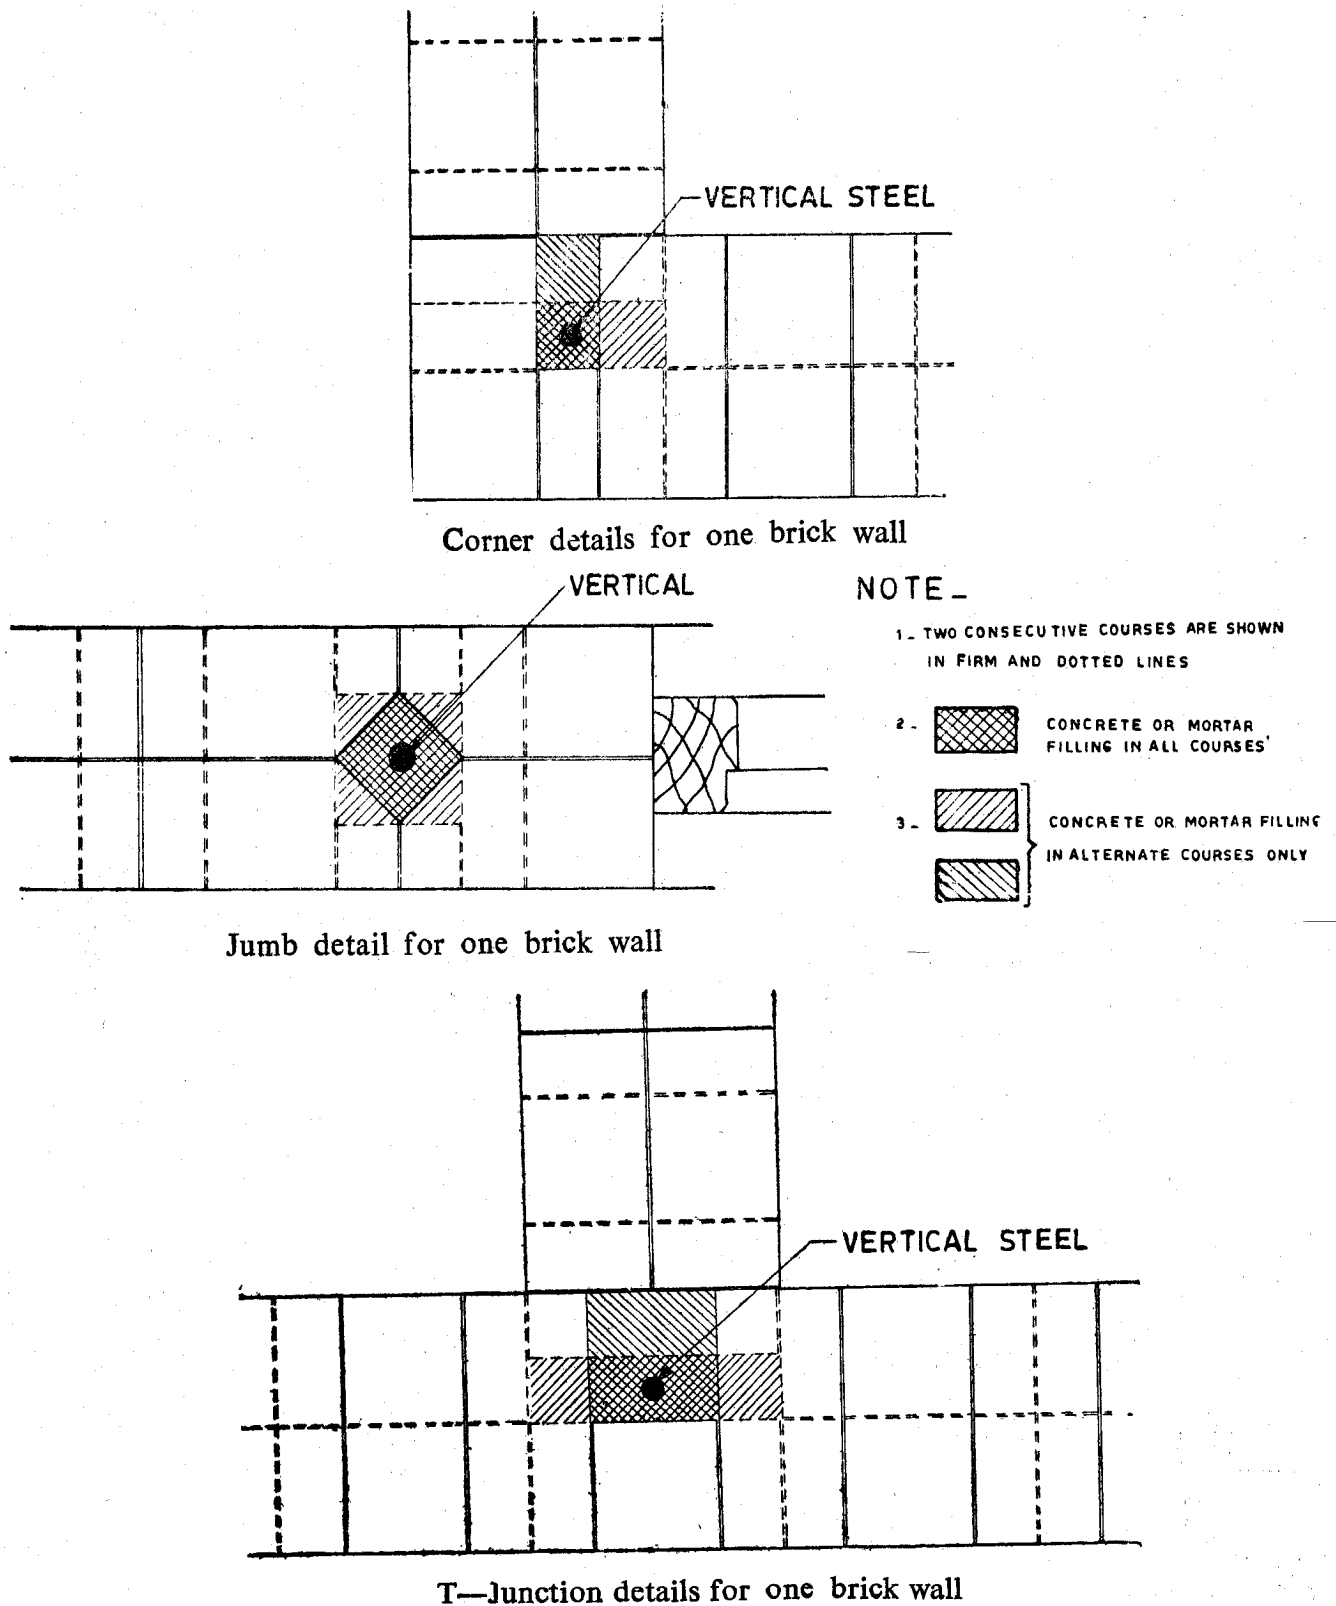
Typical junction details for providing vertical steel in brick masonry (One brick wall)
